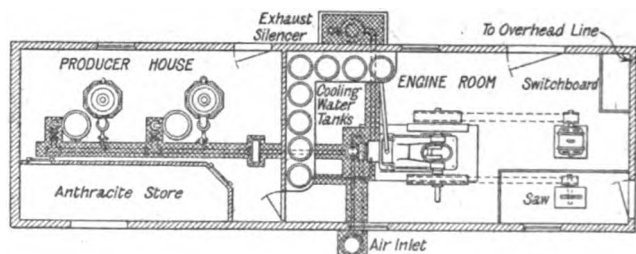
ARRANGEMENT OF PLANT IN POWER-HOUSE.
